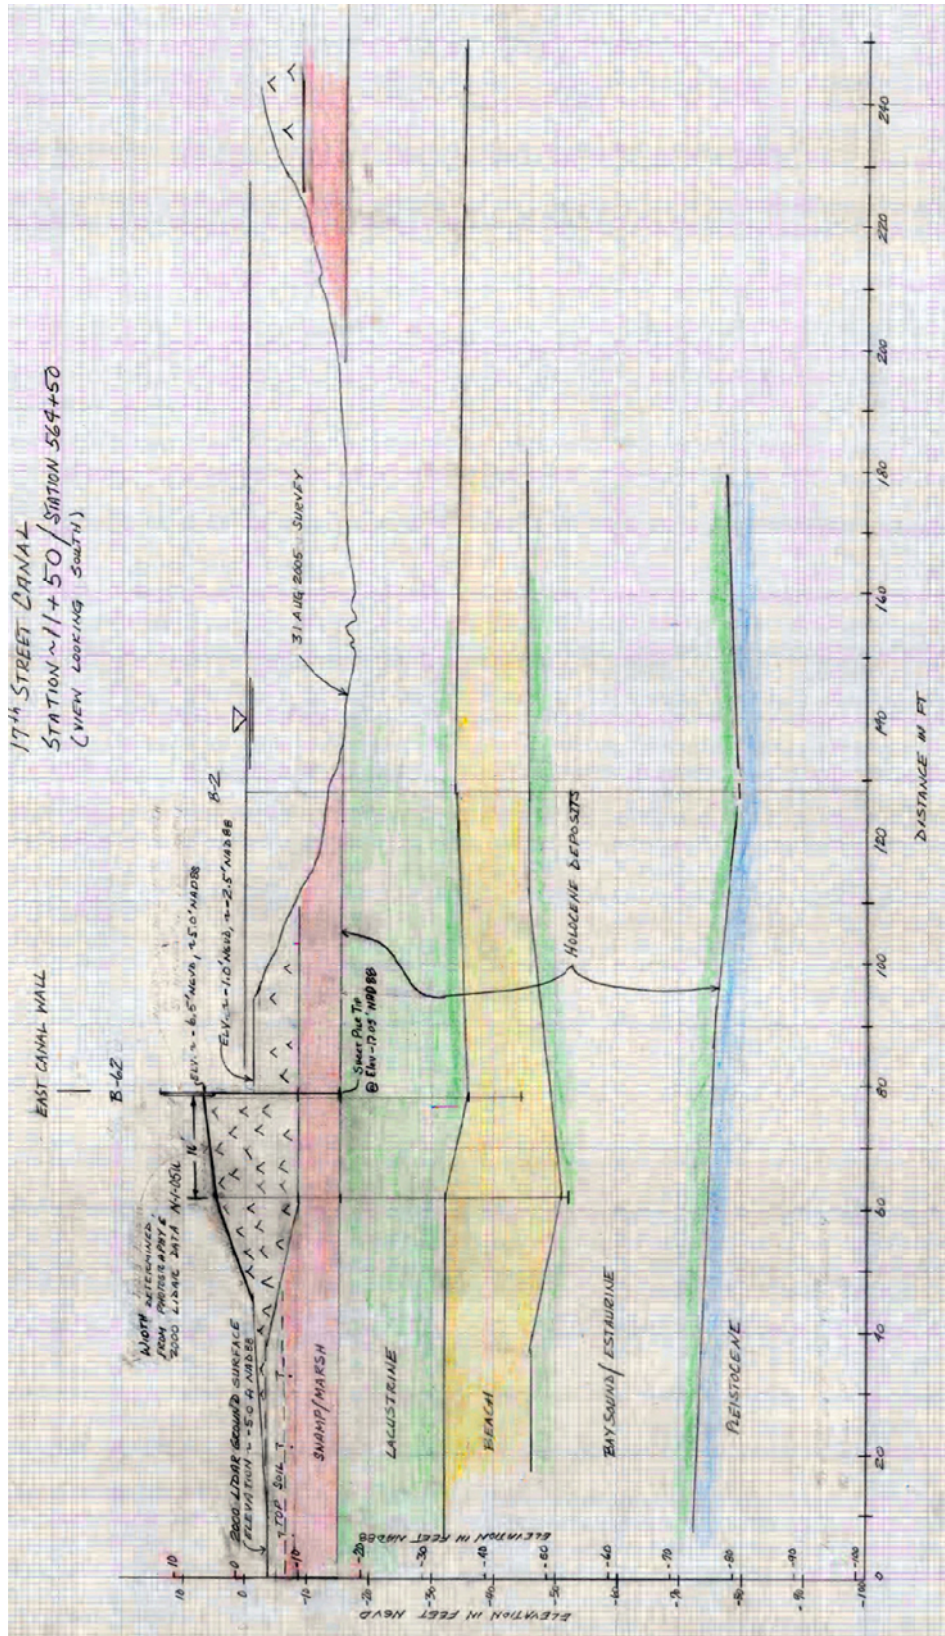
Prefailure Cross-Section at Sta 11+50 (New Stationing)/ Sta. 564+50 (GDM Stationing) (Note: Most scour occurred near this station)
